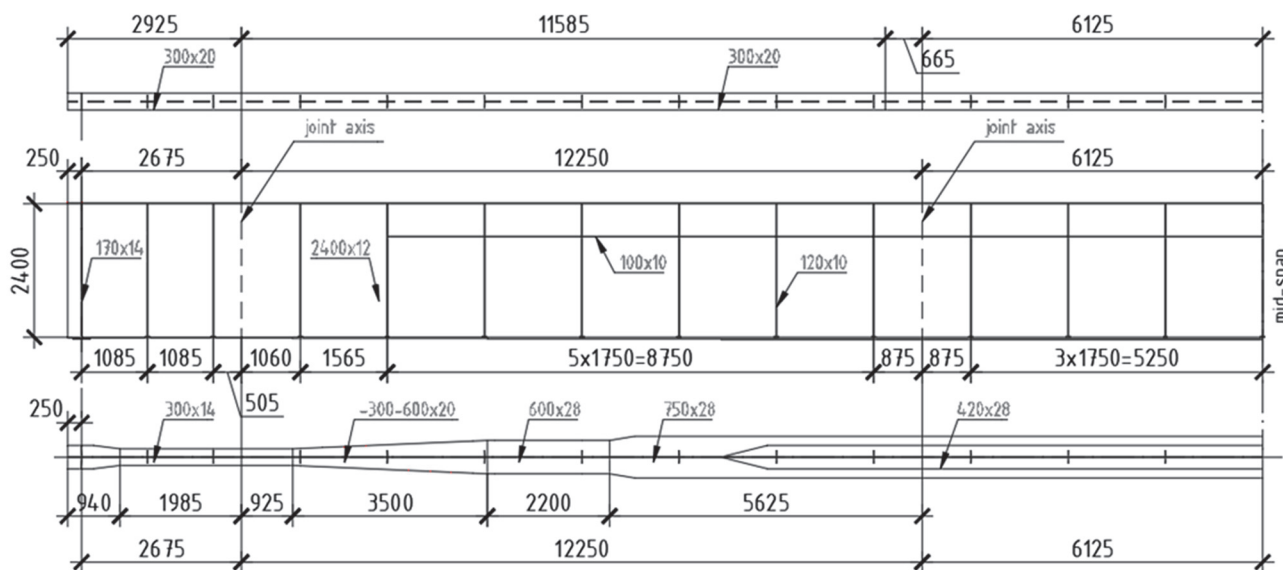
Plan of the upper and lower chords, and facade of the main beam
